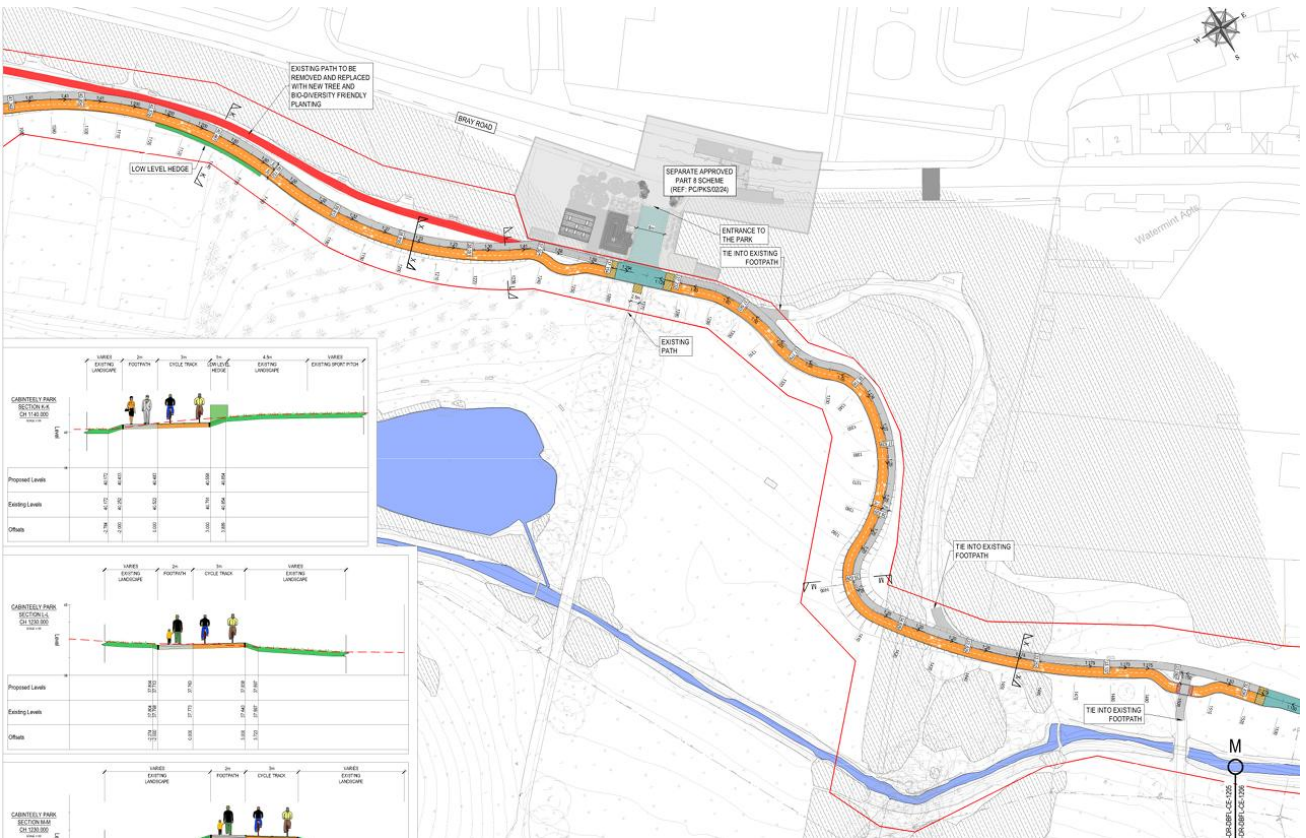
Proposed Section C(2) of Cabinteely Greenway (Source: DBFL Consulting Engineers)
